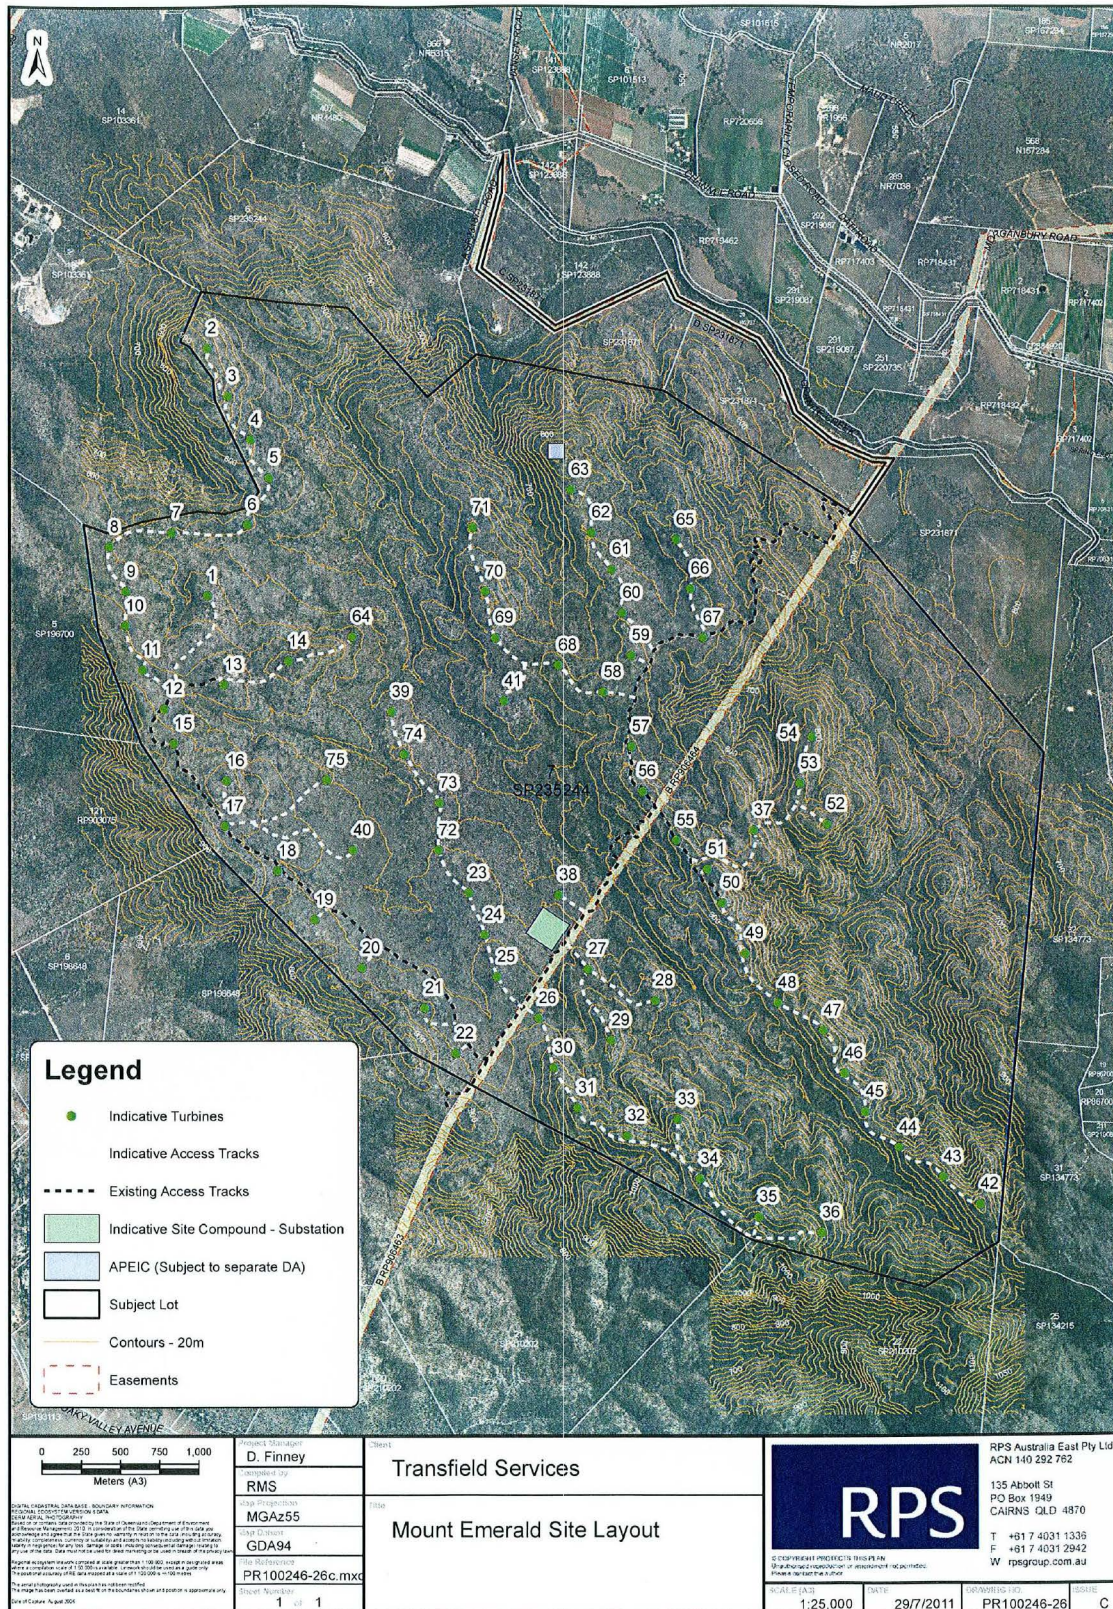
Mount Emerald Site Layout - Plan from applicant prepared RPS Australia East Pty Ltd dated 29/7/2011
